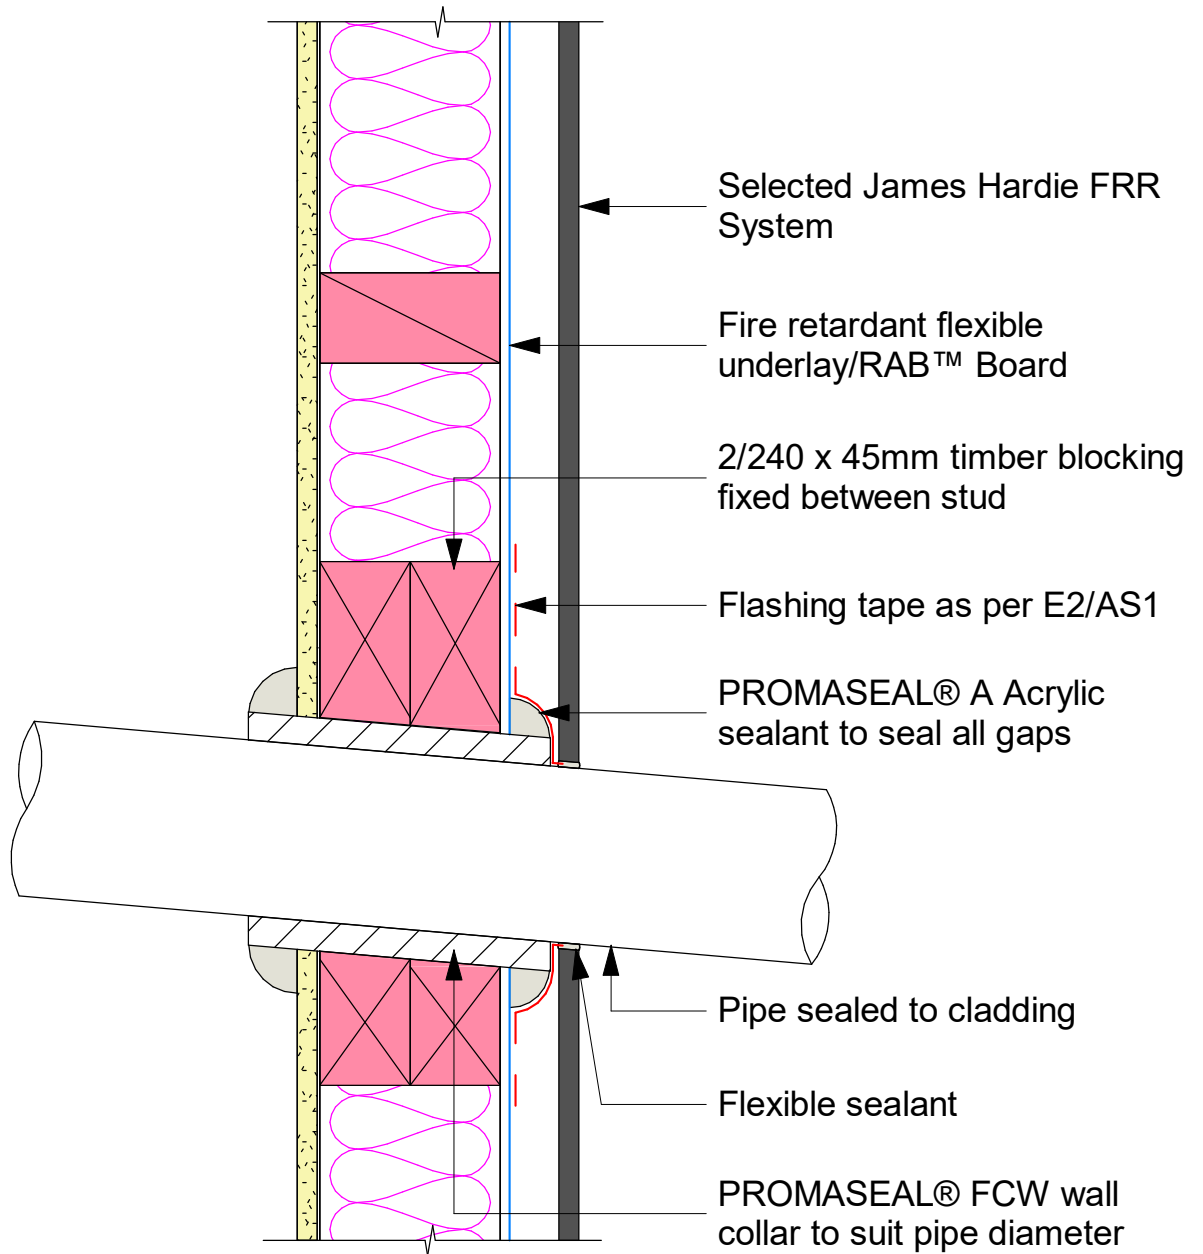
Penetration detail – uPVC pipe, RAB™ Board
